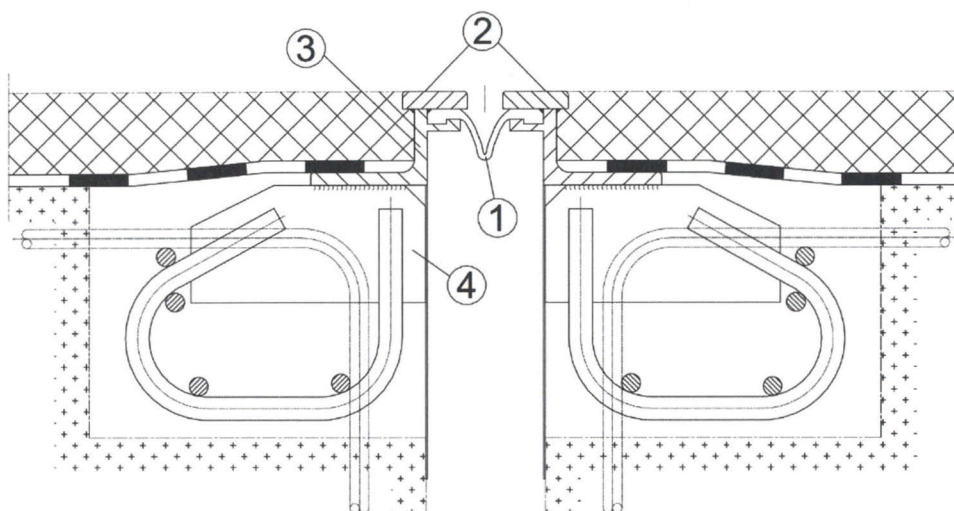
Exemplary cross section of the nosing expansion joint mageba Tensa®Grip Typ RS with seal type V-Seal, including anchorage consisting of anchor plate and anchor loop
